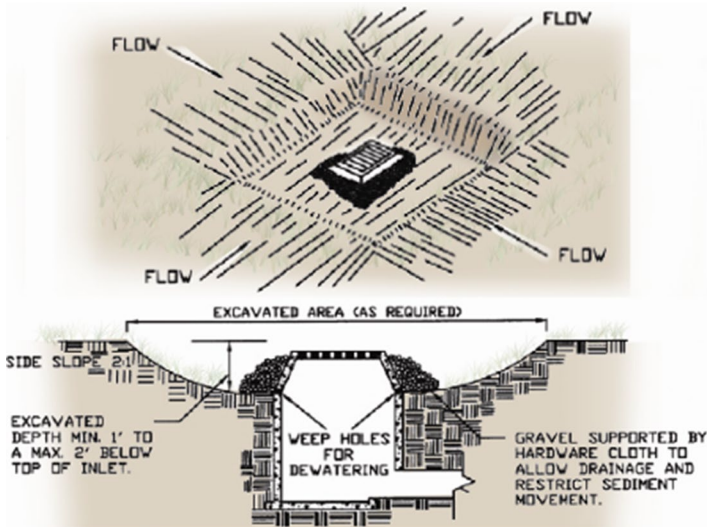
Schematic drawing of an excavated drop inlet protection with weep holes.
